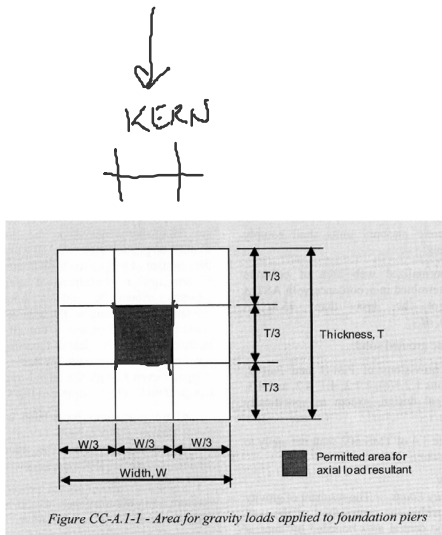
Area for gravity loads applied to foundation piers
